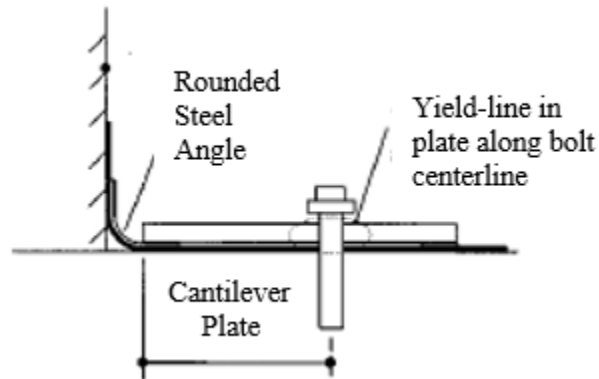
Detailed drawing of anchorage system (Hall et al., 2002)
